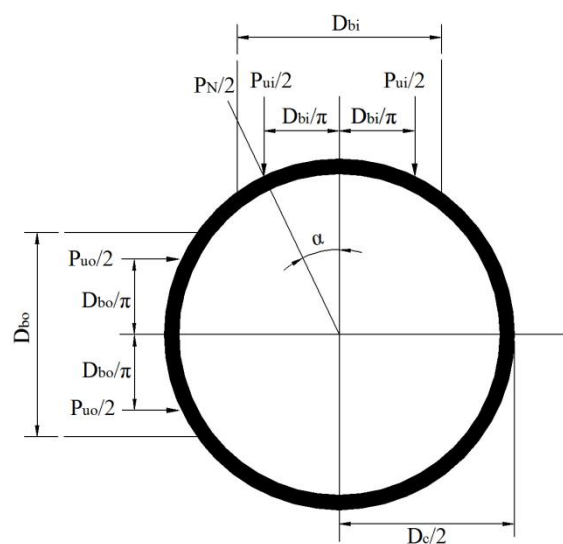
(3) Typical Cross-sectional View of a Joint
